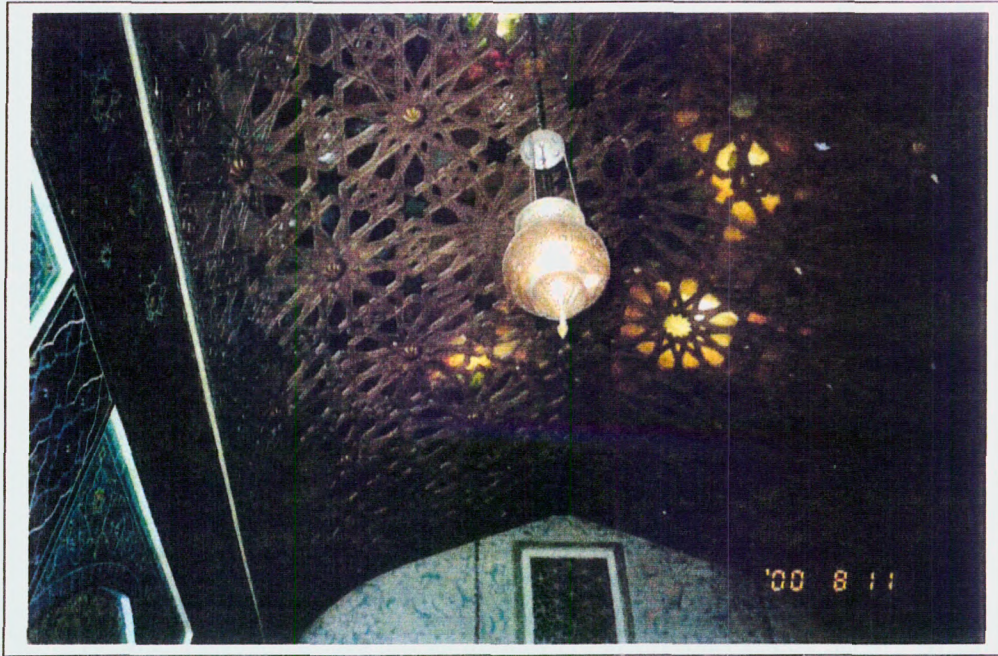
Billiards room after installation of sprinkler heads. Two sprinkler heads installed very inconspicuously on ornamental ceiling.
